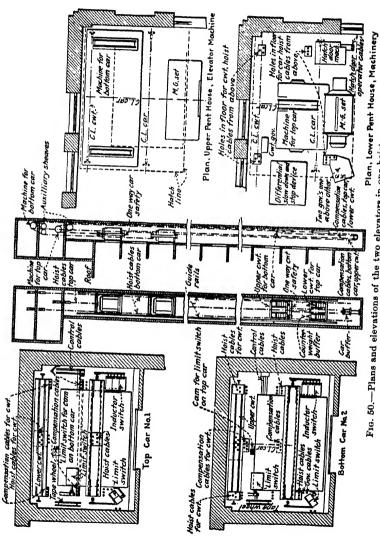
Plans and elevations of the two elevators in one hoistway.
